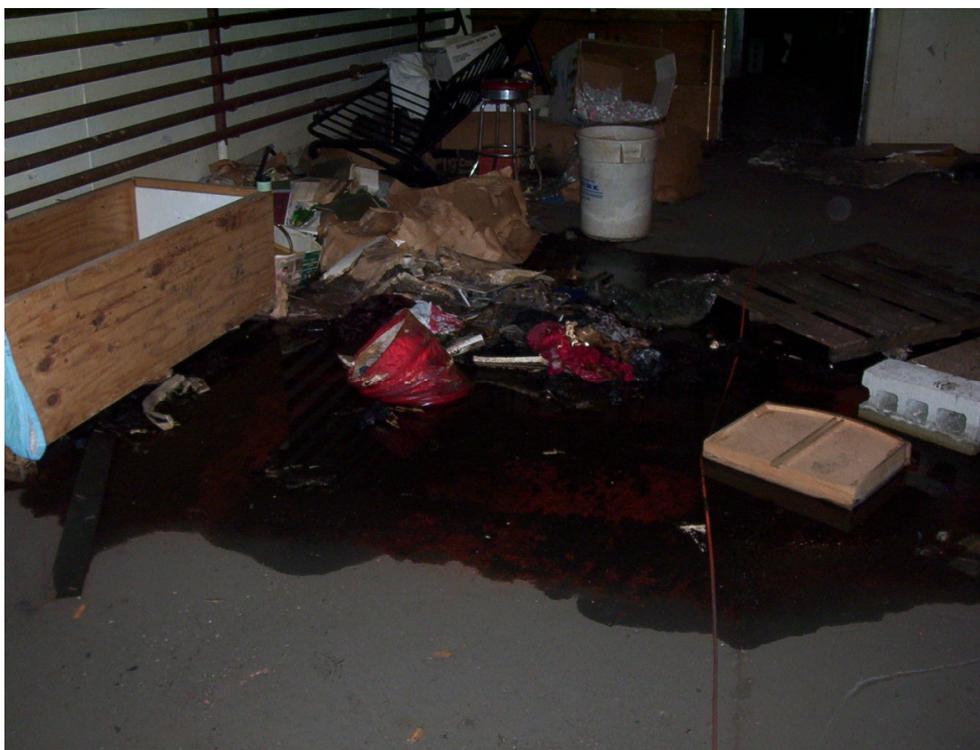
Pool of water on the third floor of 42-46 10<sup>th</sup> Avenue.
